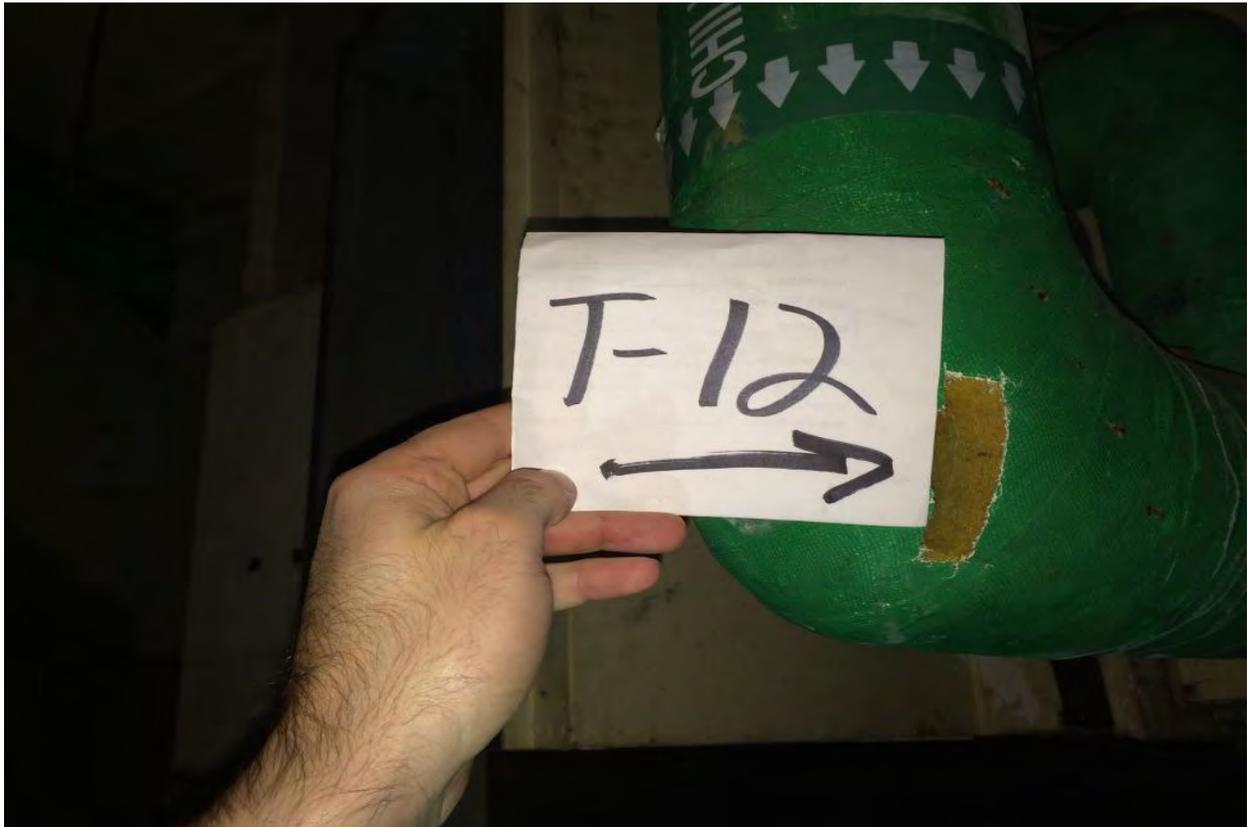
Laboratory analyses did not detect asbestos minerals within plumbing insulation sample TS-12 collected from the Theatre Building basement boiler room.
